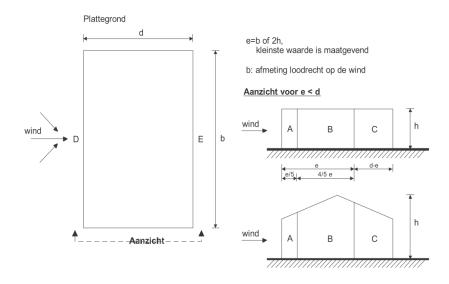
Wind zones on a building's façade (Normcommissie 351 001 Technische Grondslagen voor Bouwconstructies, 2011)
